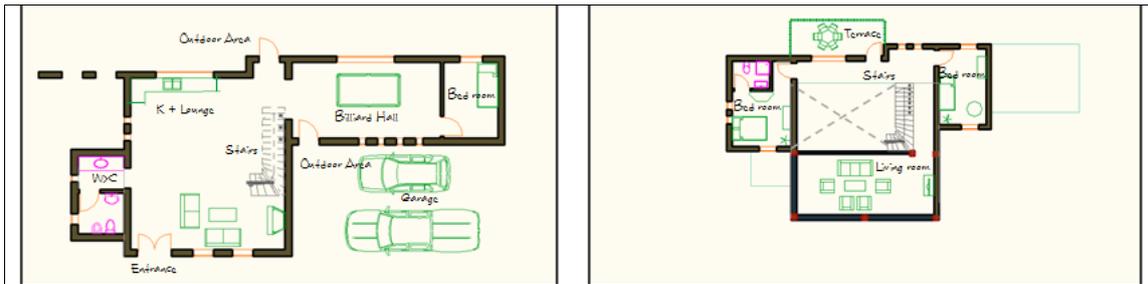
Ground and first floor plan for the second modification (Source: (By AutoCAD)).
